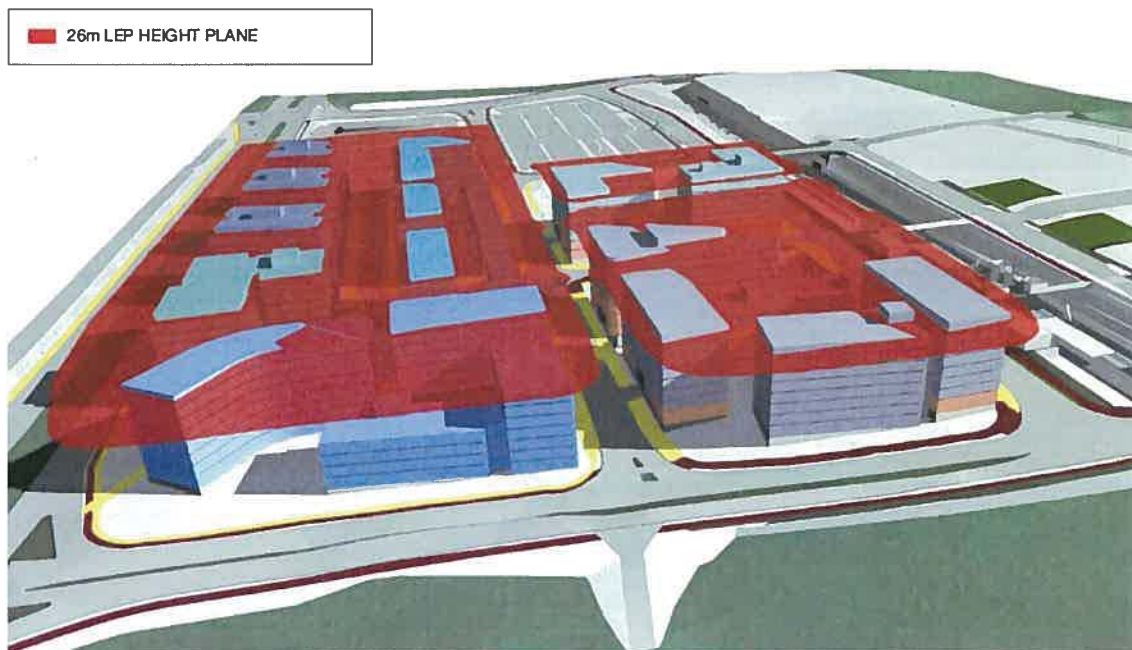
| Plan looking west showing areas of buildings above 26 m height limit (Source: Applicant's RtS)
